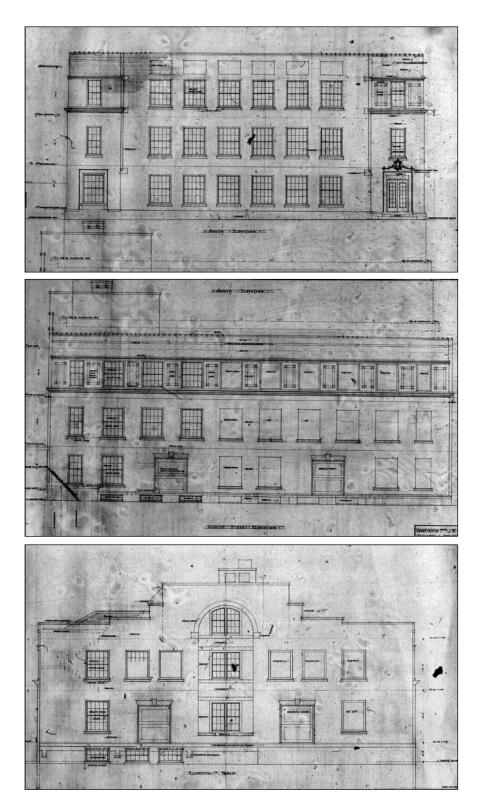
"South Elevation" (top), "Curtis Street Elevation" (middle), and "Elevation to Track" (bottom), Architect's Plans No. 2346/1914. (<u>City of Winnipeg</u>.)
